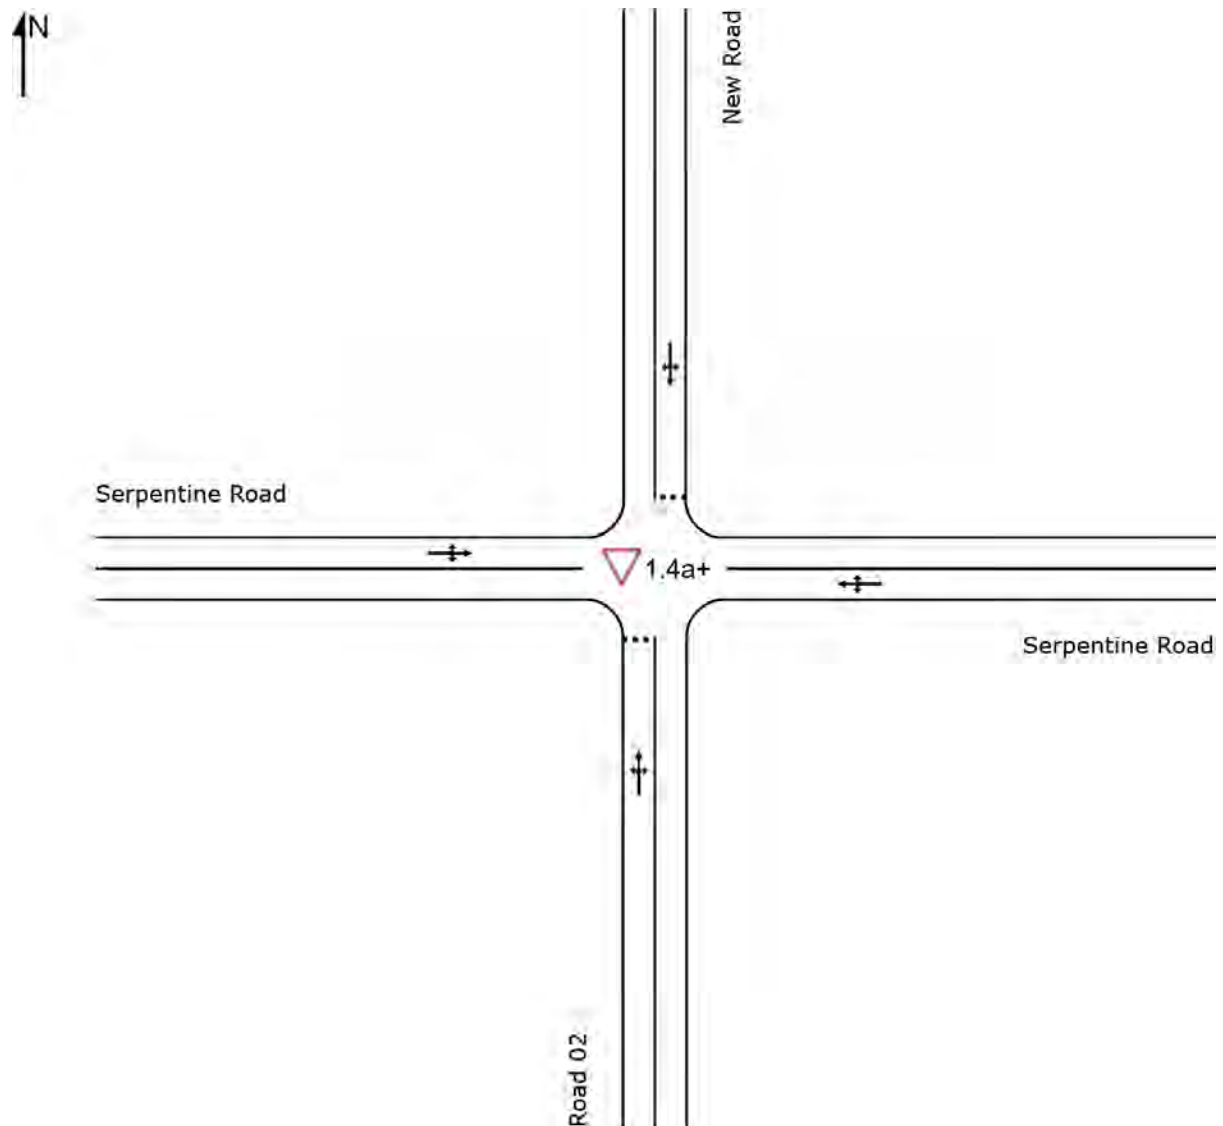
M04 Serpentine Road / Road 02 / New Road (Heritage Park)– SIDRA Schematic Geometry
